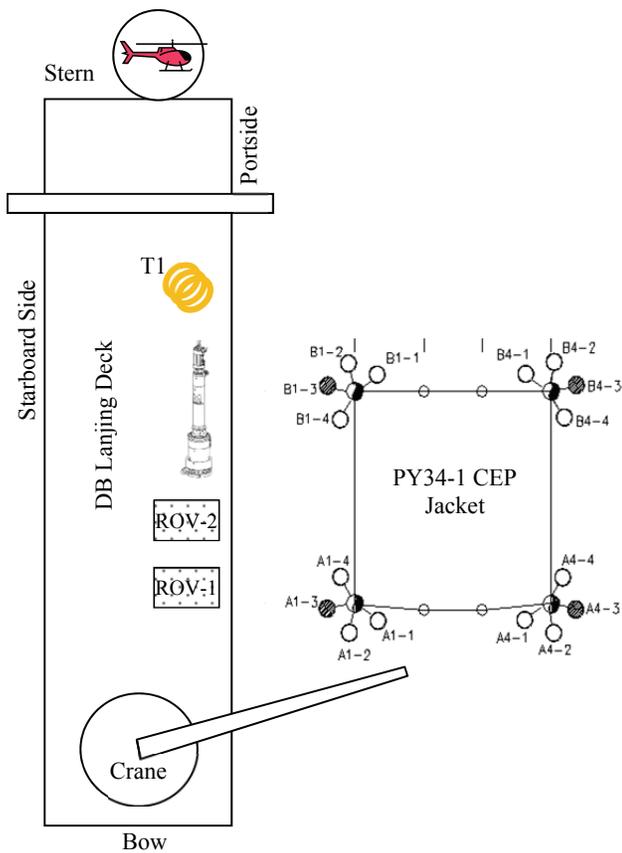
Layout Sketch of DB, Jacket and Piles: T1 Is the Location Used to Unload the UW Cable to Water.
